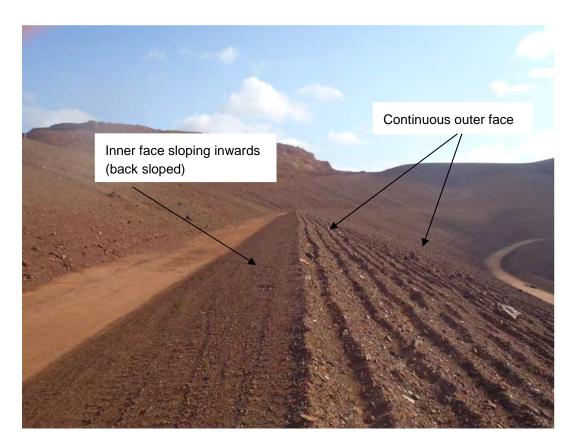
Example of berm construction showing back sloping of the berm and continuous outer slope
